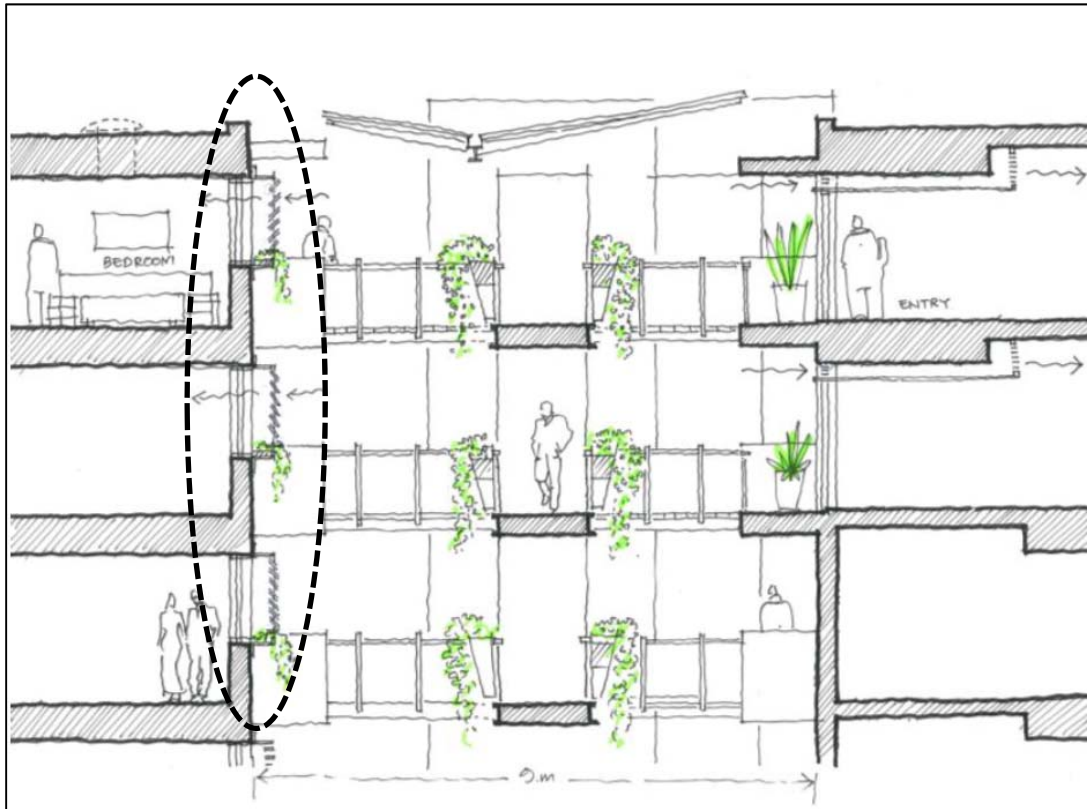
The proposed atrium/internal walkways between buildings (for Buildings B and C), with external operable privacy louvres shown.
